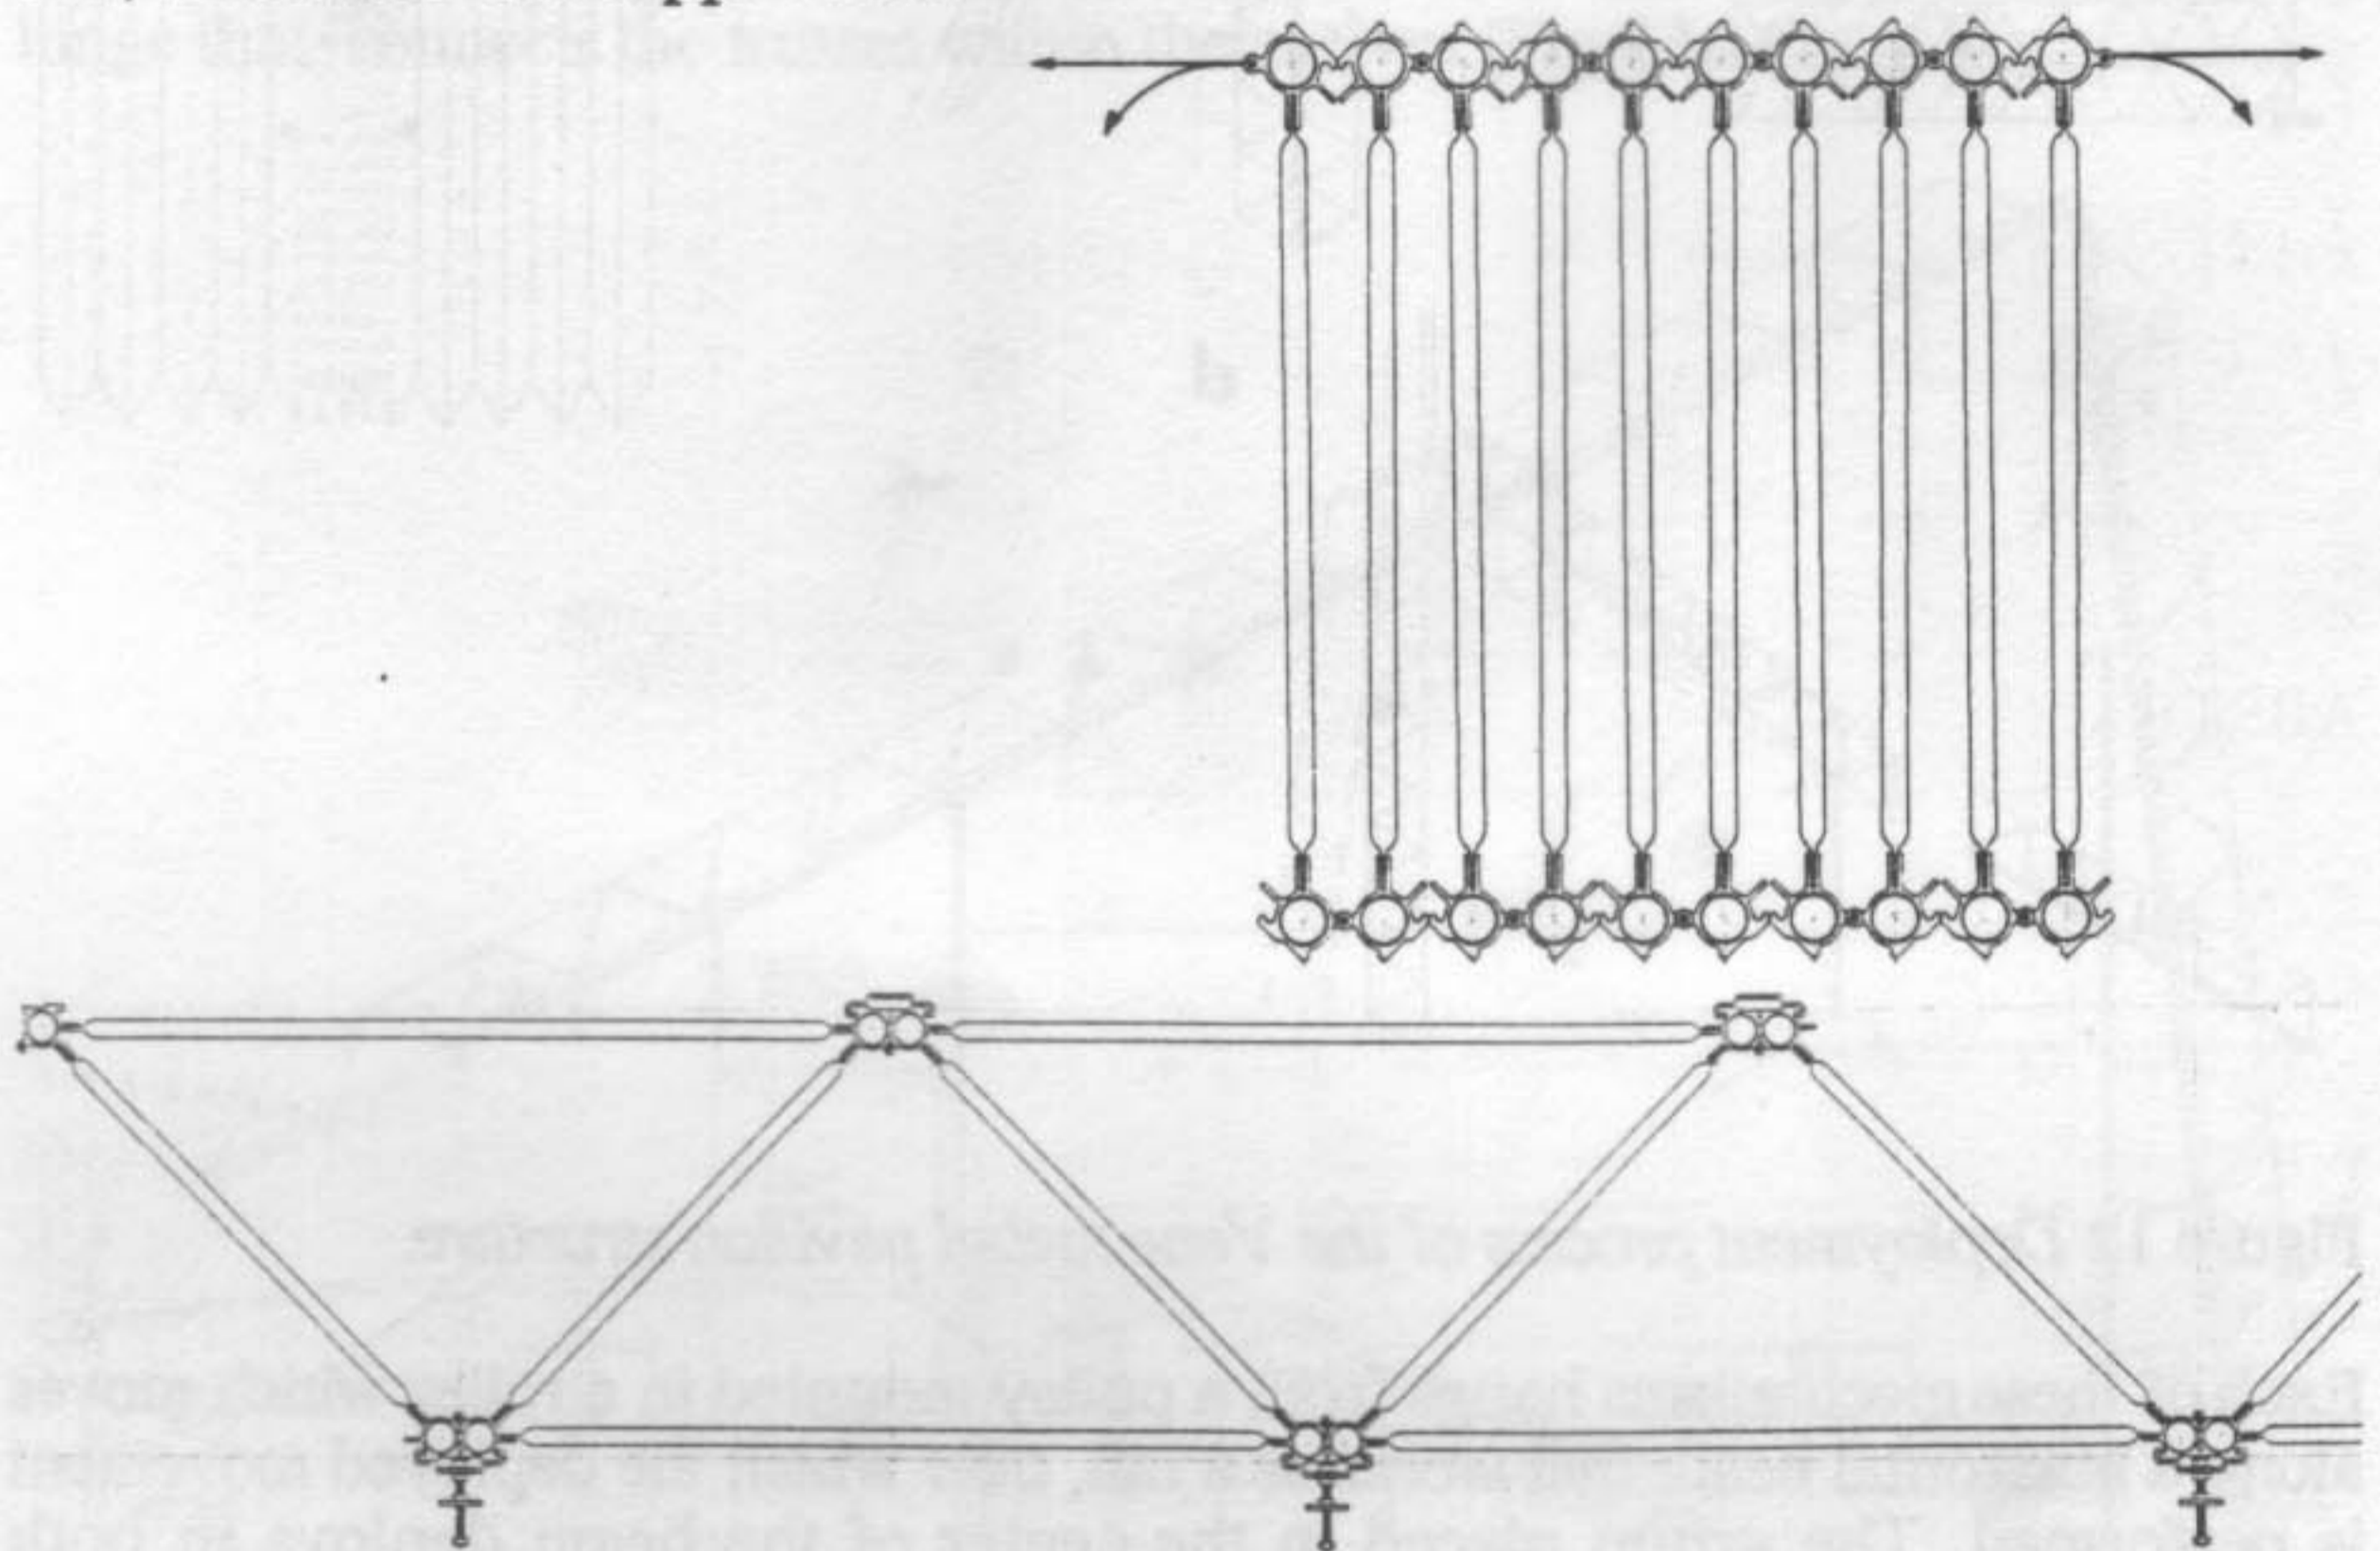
View of trusses folded and unfolded with stabilizing elements.
